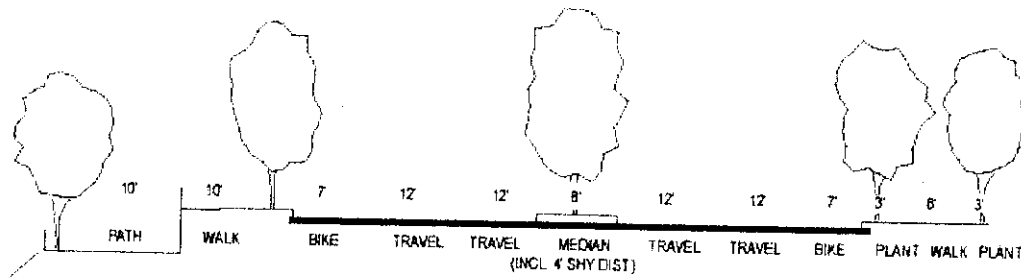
Cross-Section 100 Feet North of Clackamette Drive Overpass, Looking North
